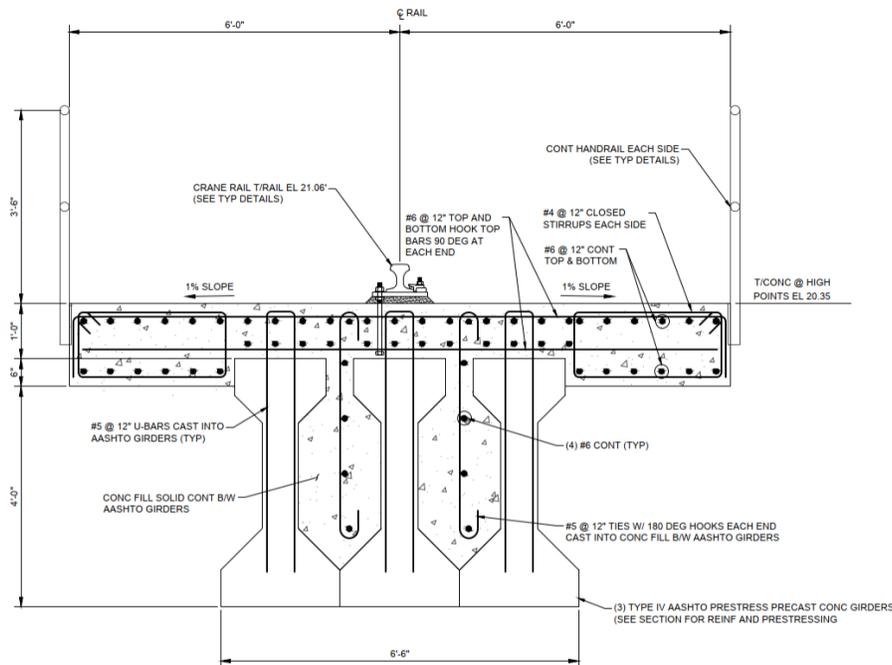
Gantry Crane Rail Beam Cross-Section
